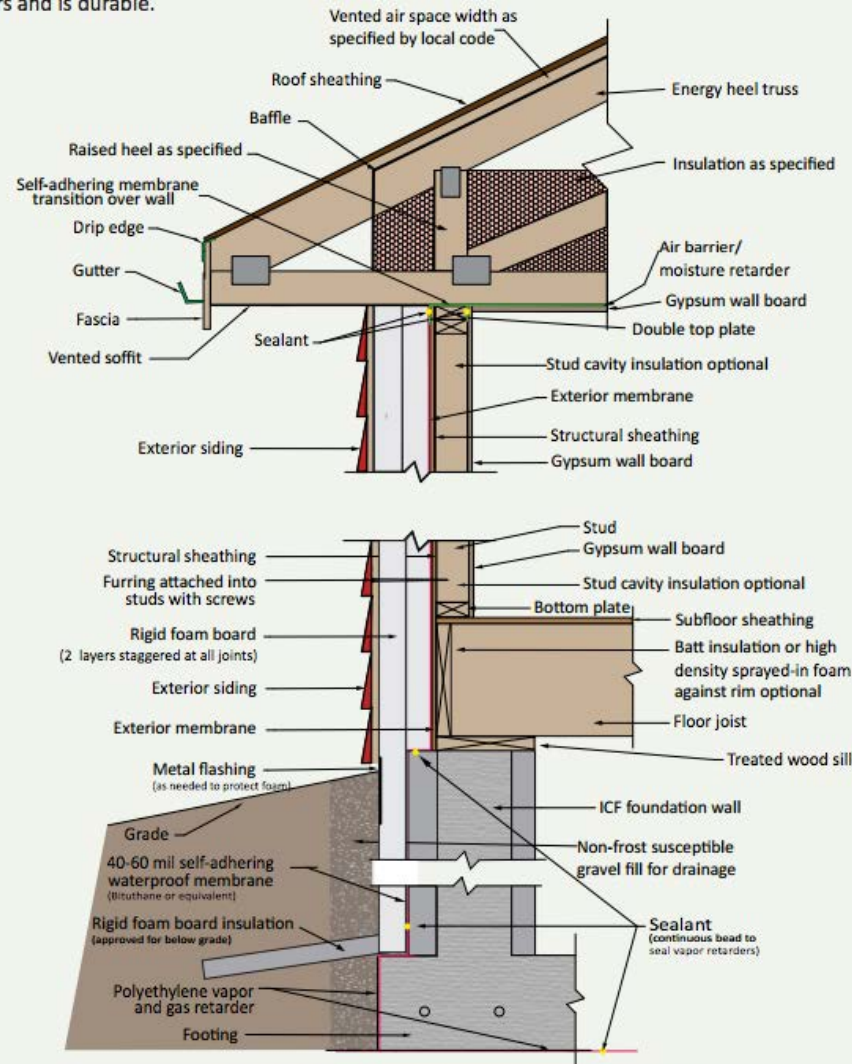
WALL CROSS SECTION of 2x4 REMOTE WALL
